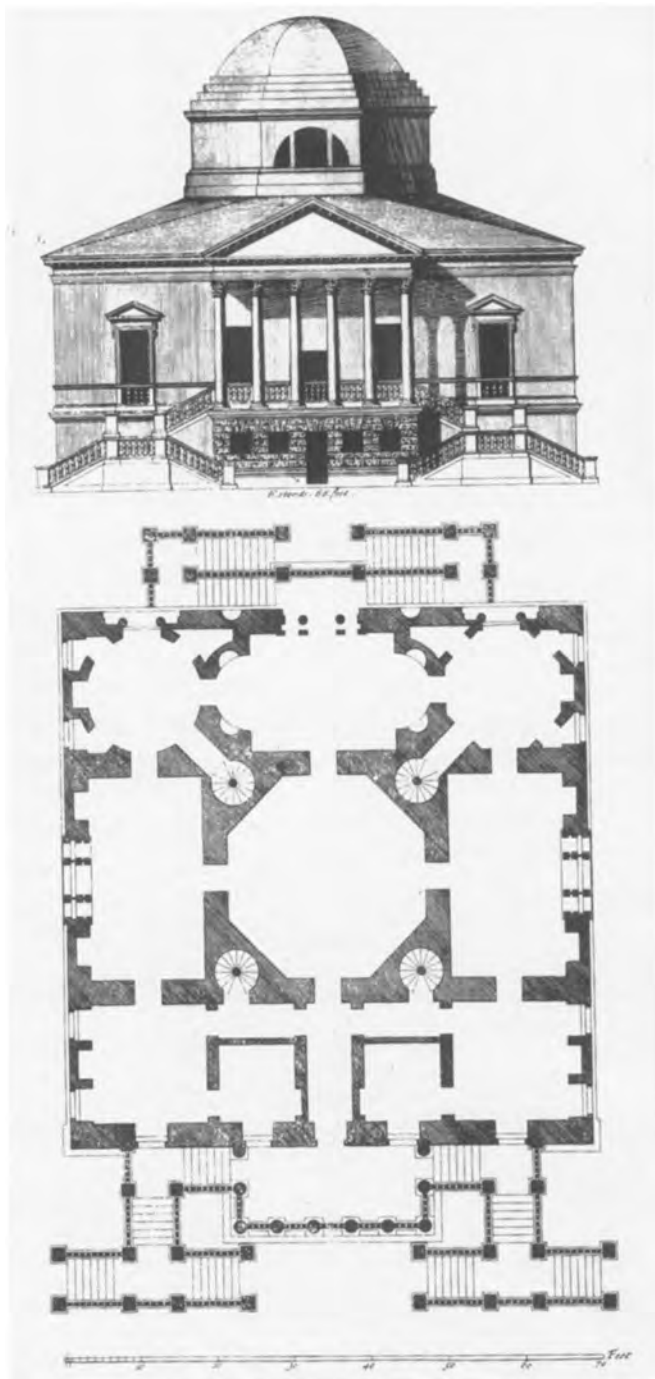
Lord Burlington, Chiswick House, ca. 1724, front elevation and main floor plan. Engraving, publ. 1727.
